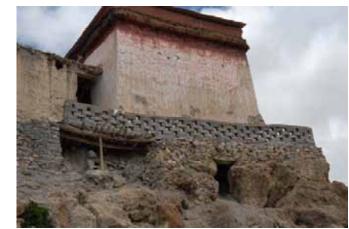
Foundation undermining along western side of Upper Temple (note wood post and beams).
